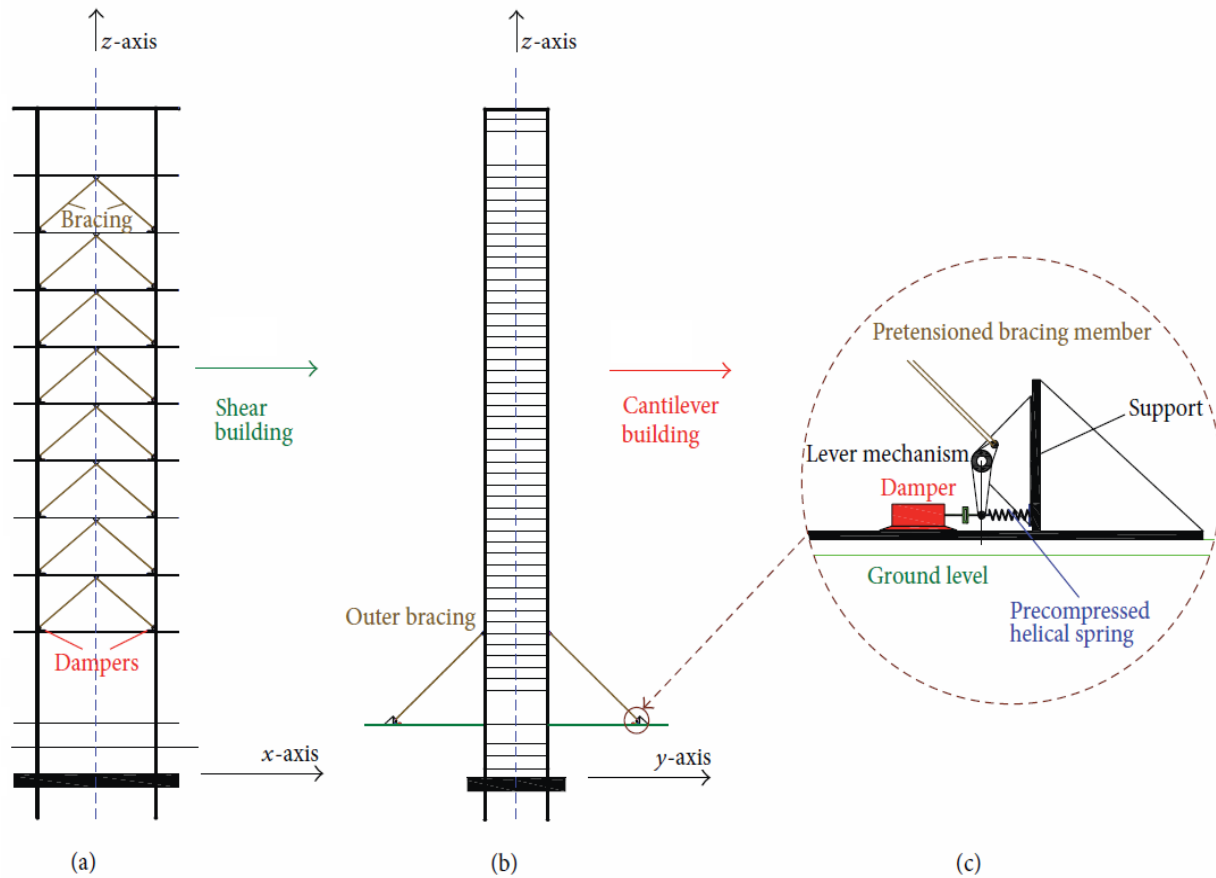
Proposed configuration of viscous dampers with bracing system: (a) bracings with dampers between adjacent floors for shear buildings; (b) outer bracings with dampers for cantilever and slender buildings; (c) damping unit consisting of a viscous damper, helical spring, and a lever mechanism for drift amplification across the damper.
